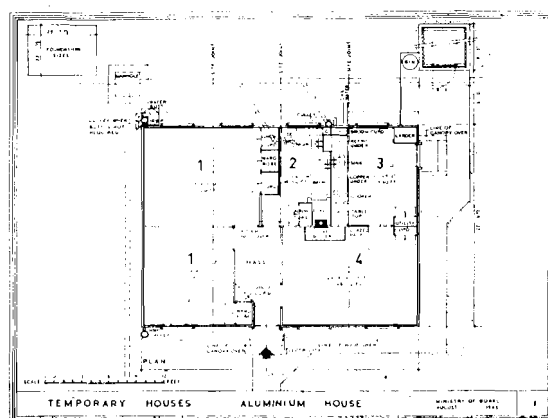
U.K. Ministry of Works (1945). One-storey temporary prefabricated house of the “four-square” plan. Floor area about 57 m². 1 bedrooms, 2 bathroom, 3 kitchen, 4 living-room.
